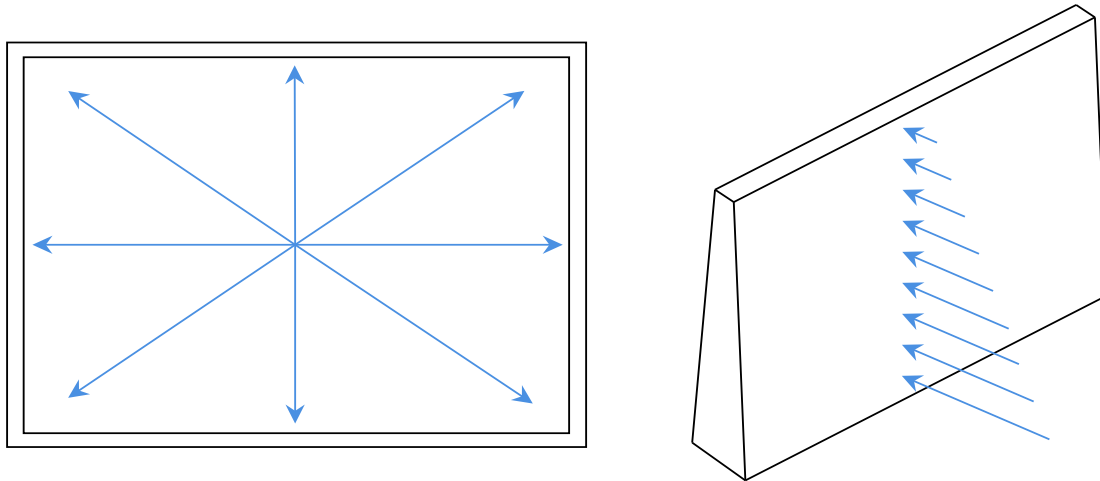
Illustration of flexure inducing forces in rectangular WRS from hydrostatic load. Plan view (left) and isometric (right).
